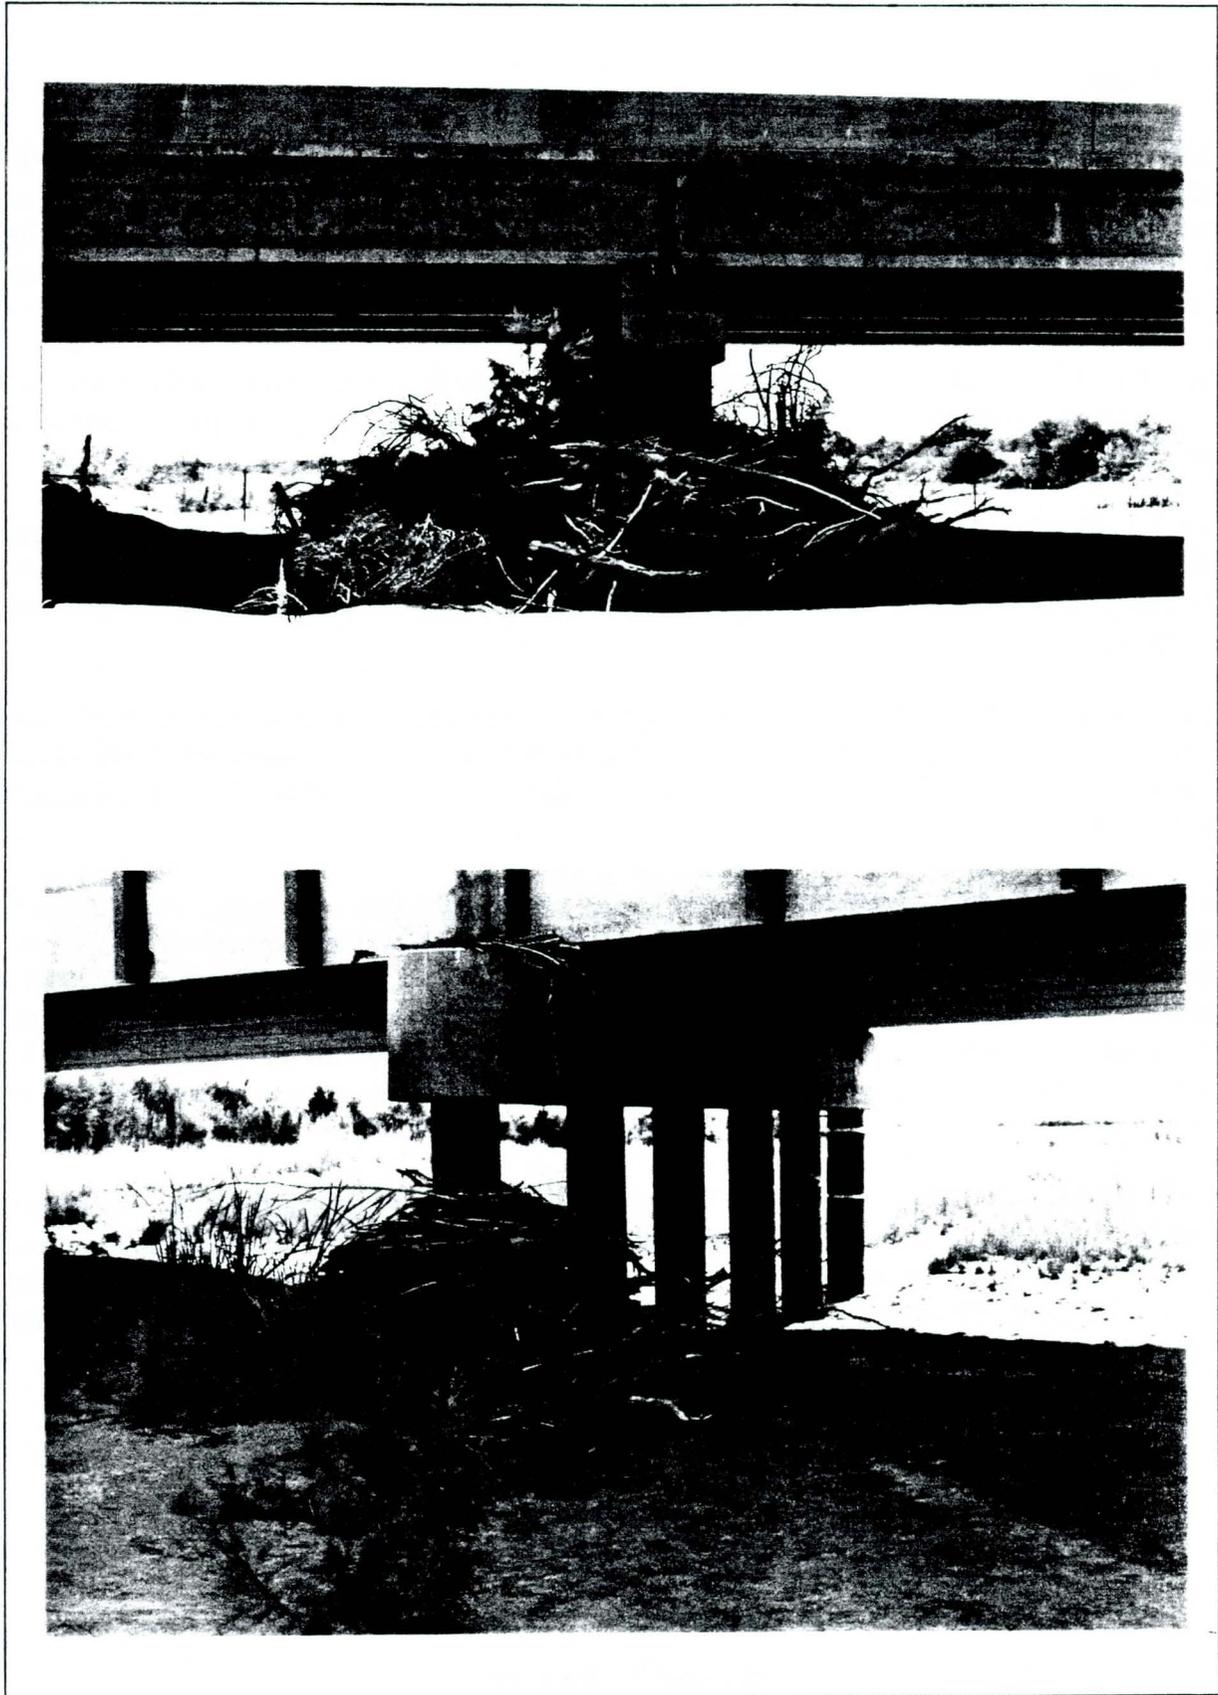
Photographs of Agua Caliente Bridge (top) and Avenue 64 E Bridge (bottom) Showing Debris at the Bridge Piers
